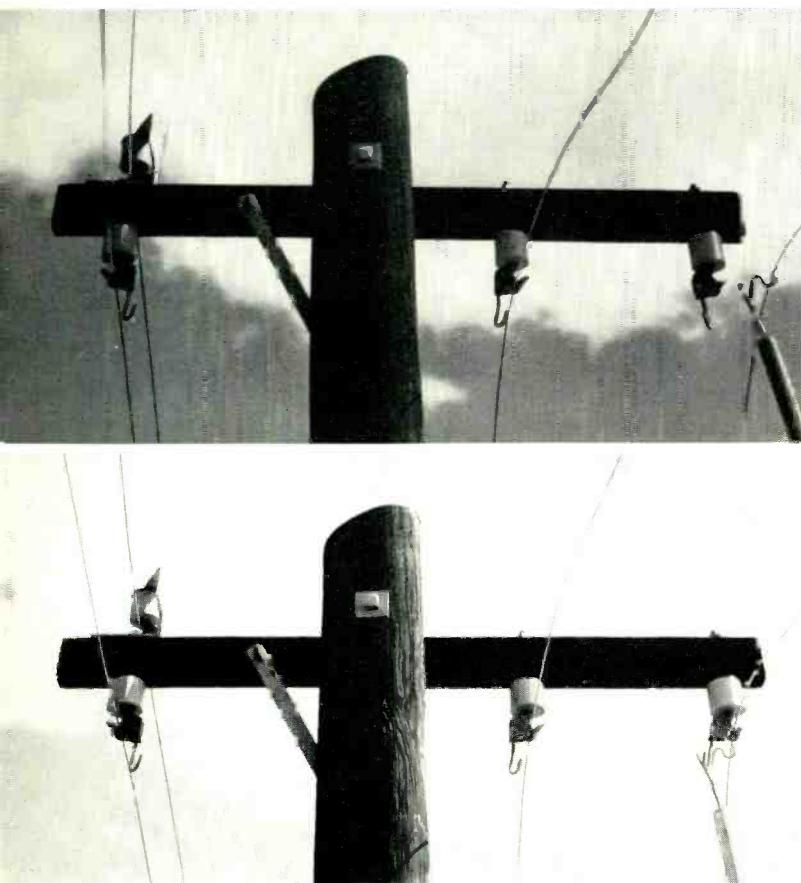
Left, two views of the wire-raising tool being used to place a wire on the insulated support.
